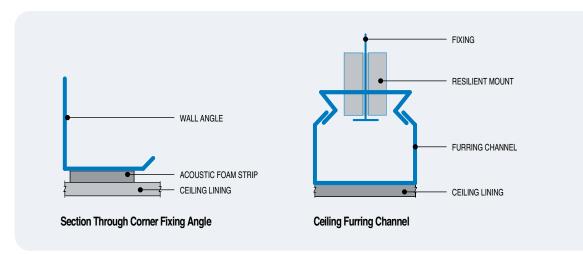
Resilient mounted ceiling lining. Resilient mount and furring channel detail
